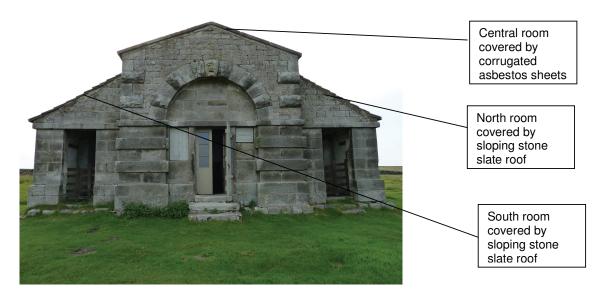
South elevation: gaps suitable for bat entry into potential roosts between overlapping stone slates
